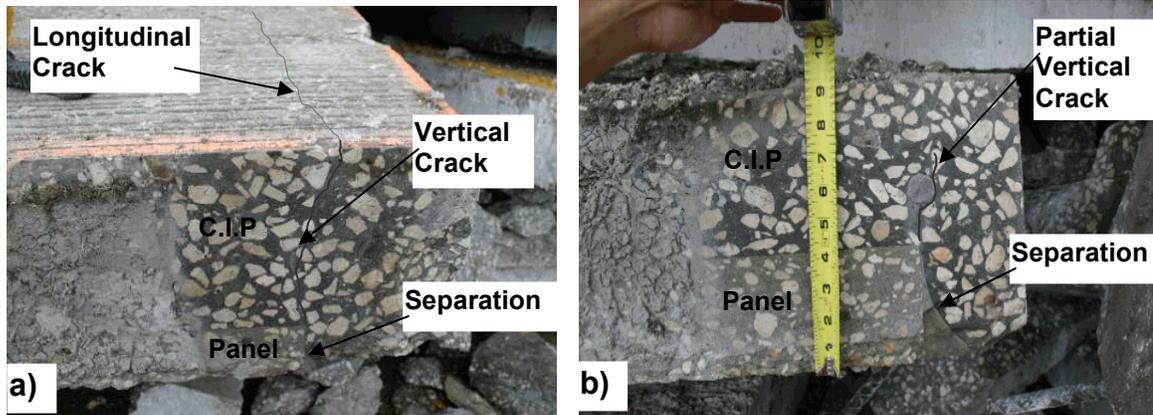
Surface Longitudinal Crack Bridge # 130085
